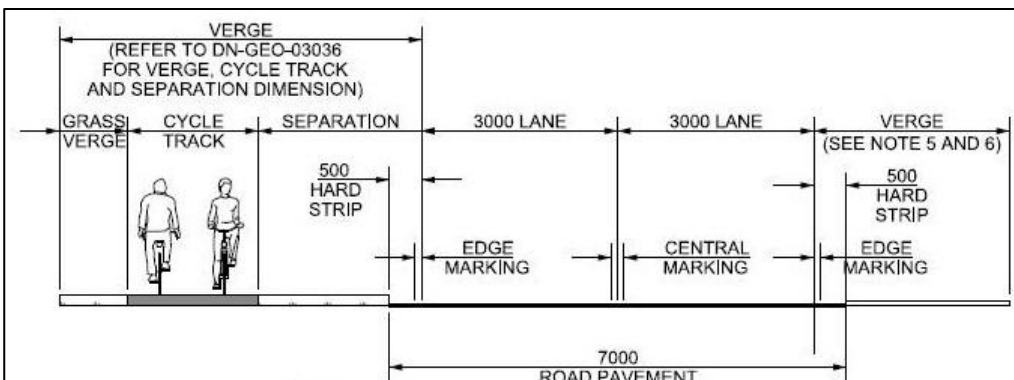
Type 3 Single Carriageway Side Road Cross Section
